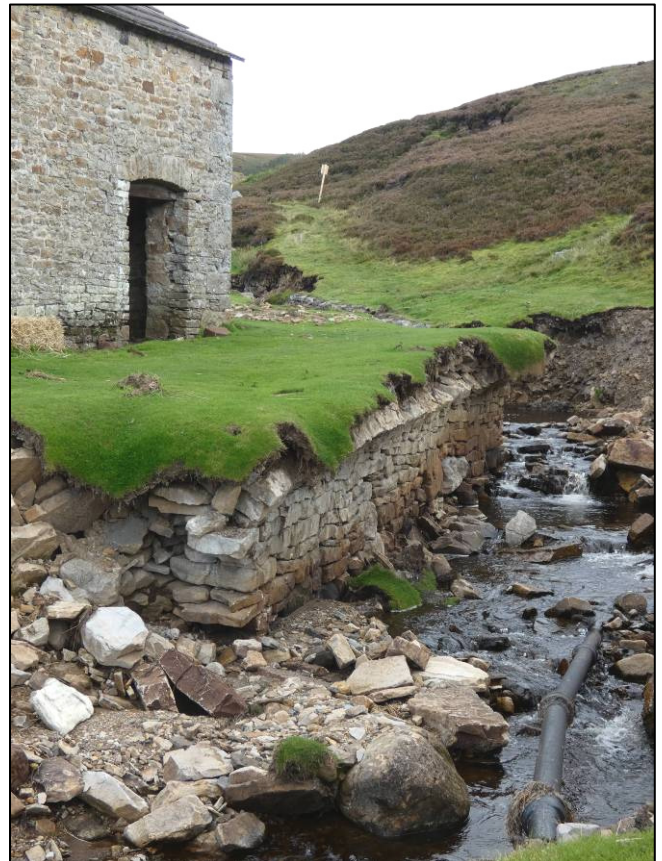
Remains of culvert wall, east side of beck adjacent to smelt mill, looking SE (photo 2/873).
